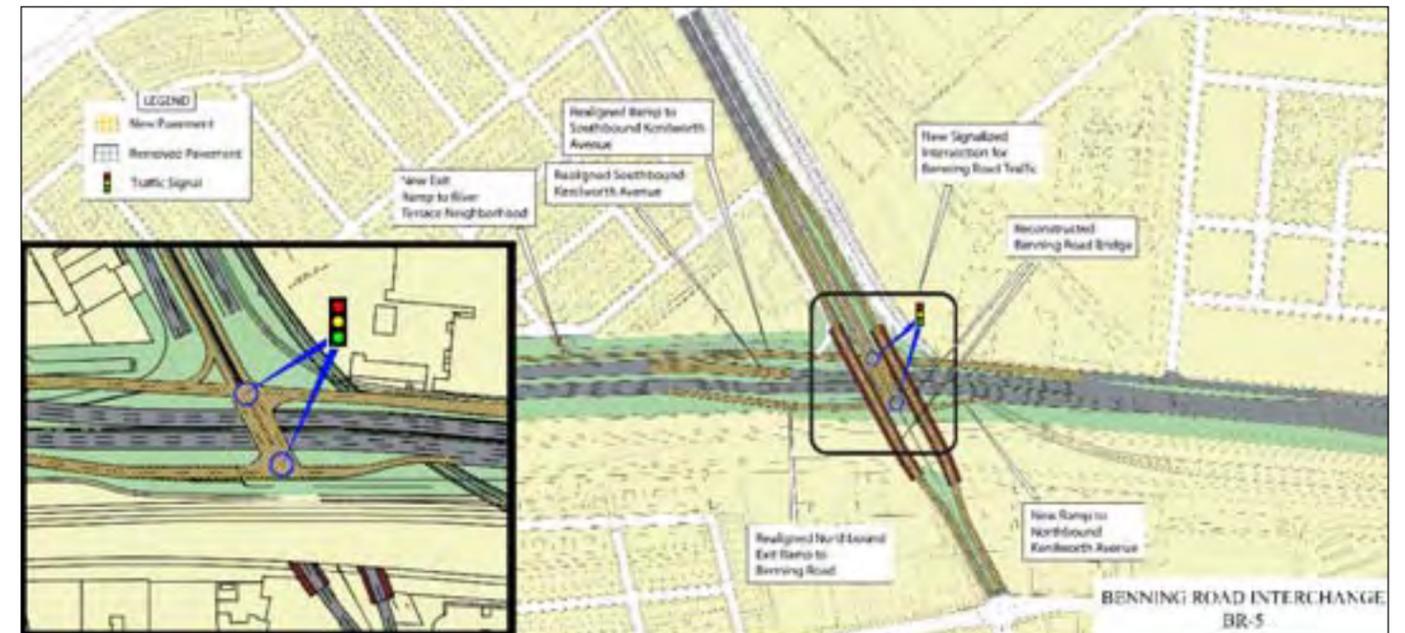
Scenario BR-5 (Allows for all movements through a new interchange located south of the existing bridge)
